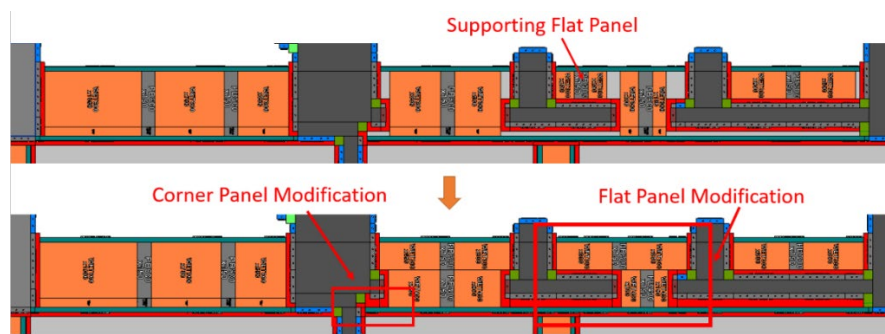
The condition of formwork layout planning on the bottom face of a beam
